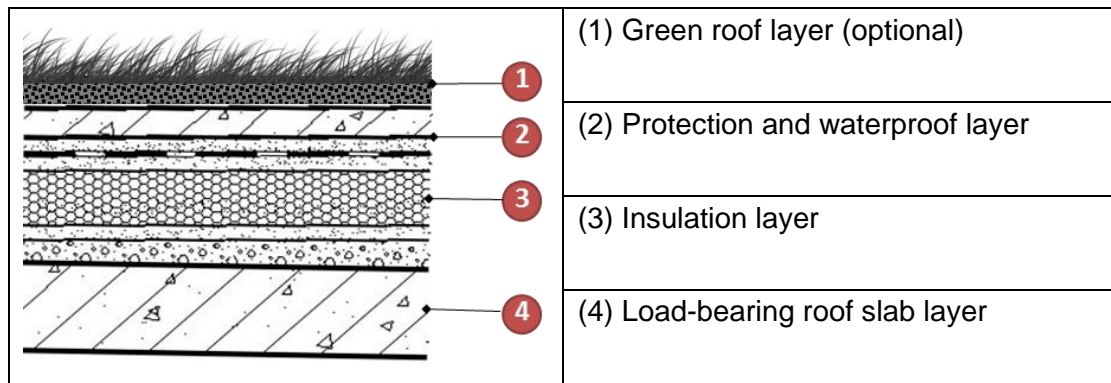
The schematic structure drawing for the 4-layer-model of roof
